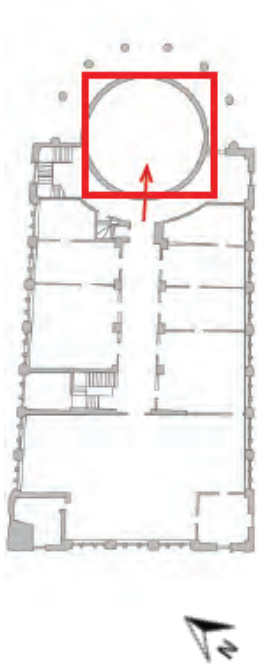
Figure 9: Rotunda and domed ceiling with oculus, Source: Germantown Town Hall Studio 2011
